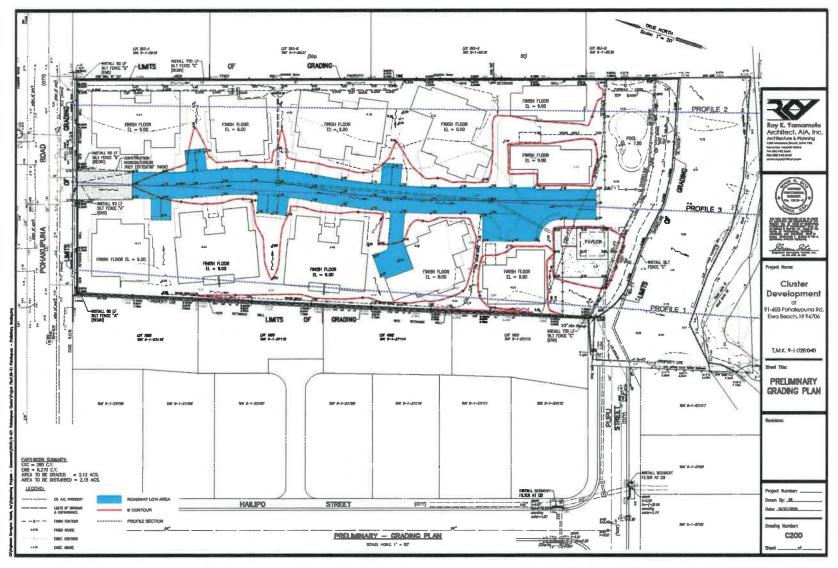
Proposed Development and Inundated Low Elevation Area in the Proposed Development Preliminary Grading Plan for 91-603 Pohakupuna Road
